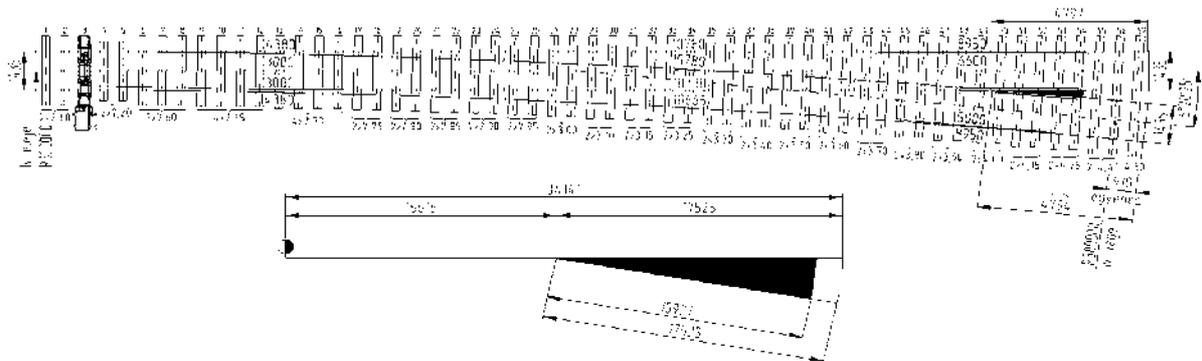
Layout plan of VAMAV 60-1:9-R300 turnout
